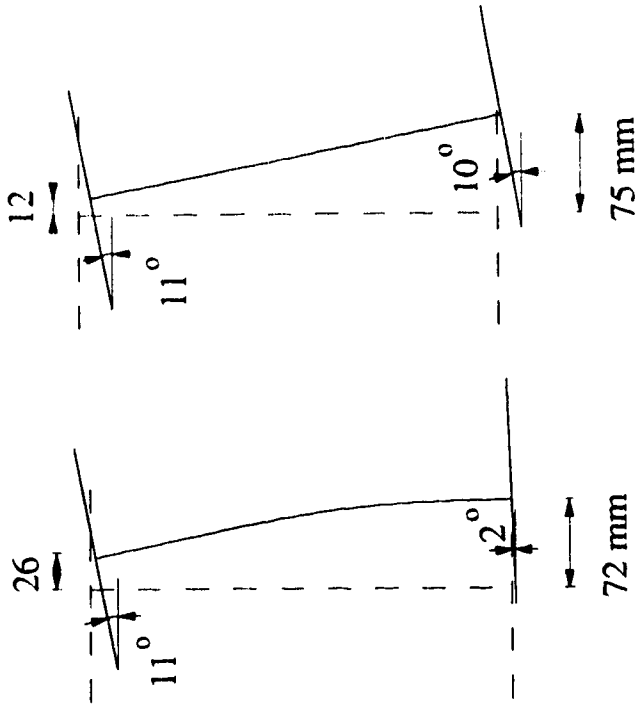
Plan view of longitudinal buckled shape in test 5
